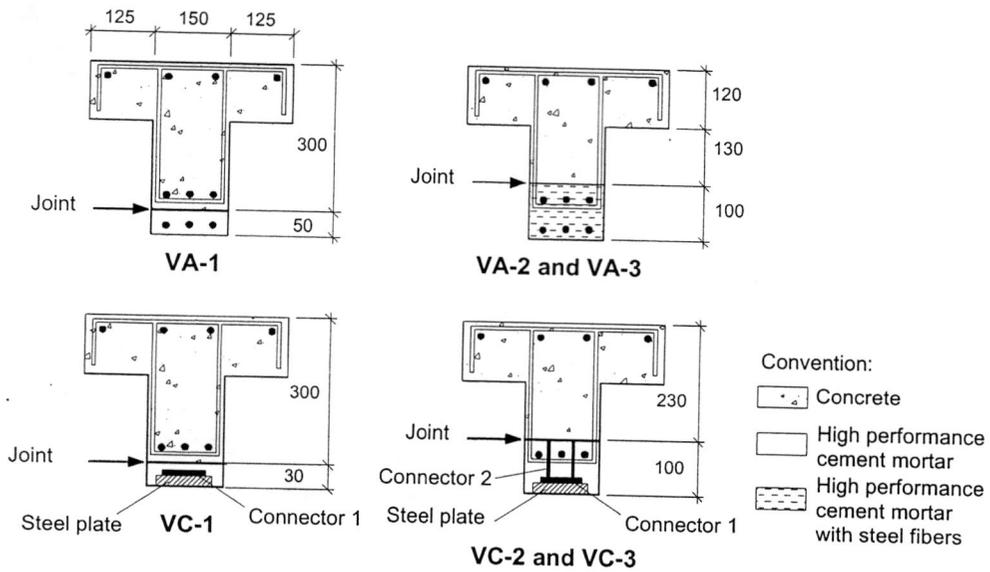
Transversal sections of the beams tested by REIS (1998) [2]
